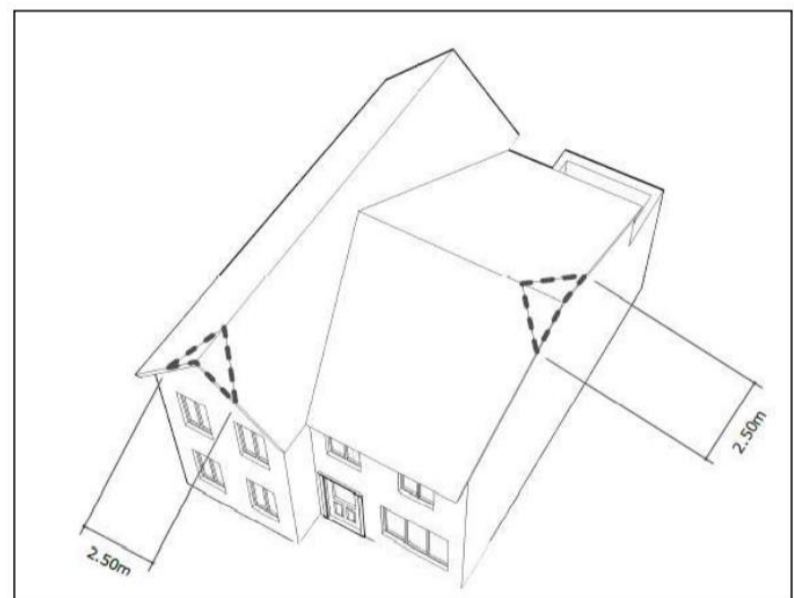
Exceptions for gable ends, dormers and roof projections and dormers
